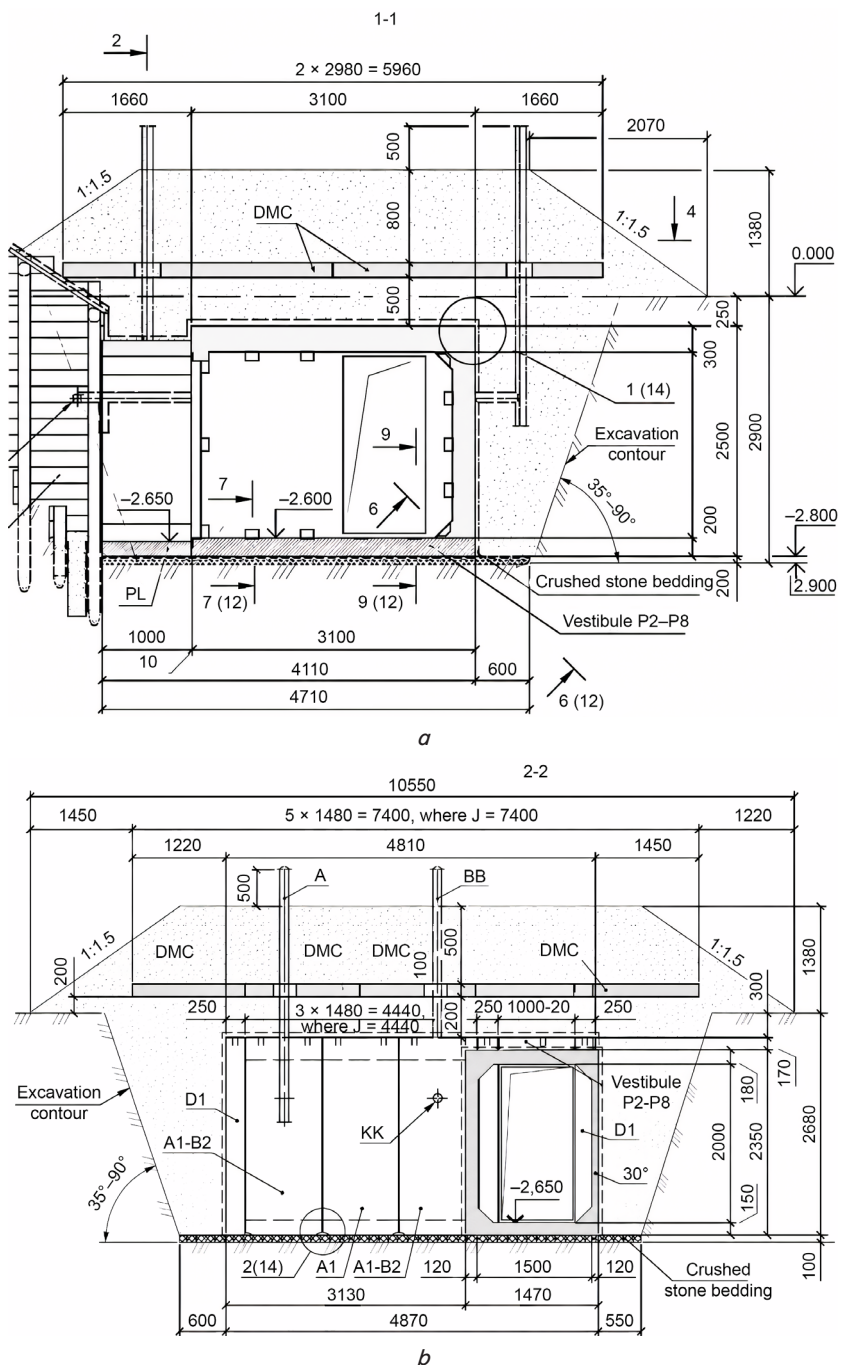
Structural diagram of reinforced concrete structures for the SHS UFS-1 protective shelter: a – side view; b – front view
